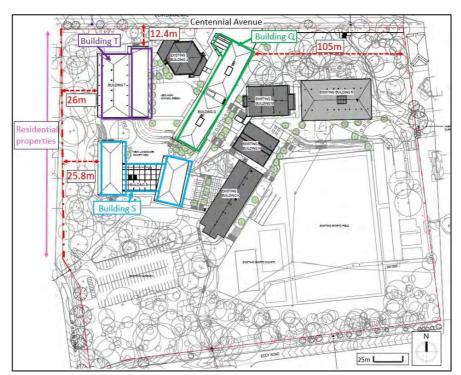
| Proposed CHS site plan with distances of new buildings from adjoining residential properties indicated (Base source: EIS 2020)
